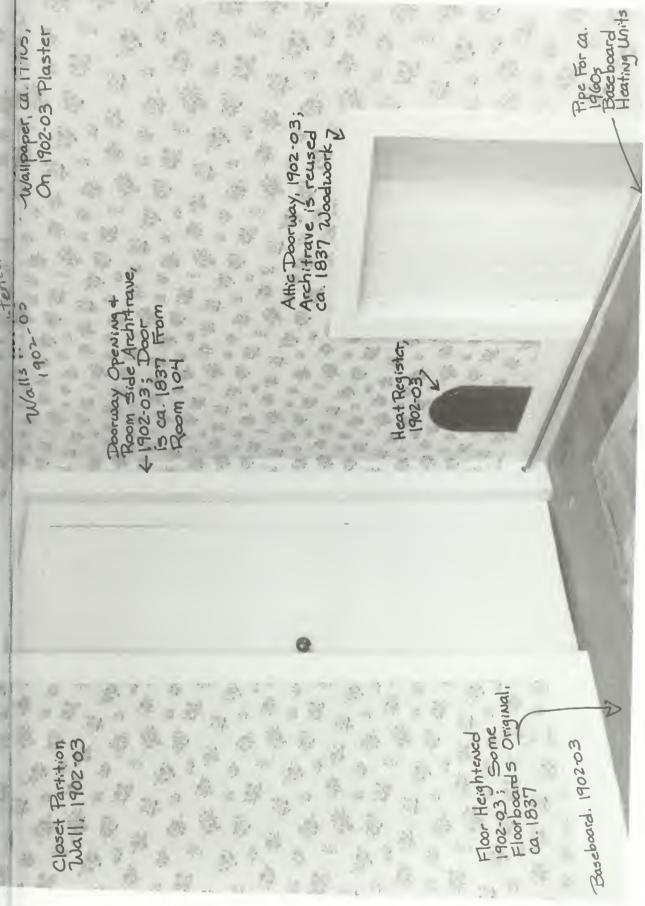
Stanton House: Room 204, looking northeast, June 1982.
